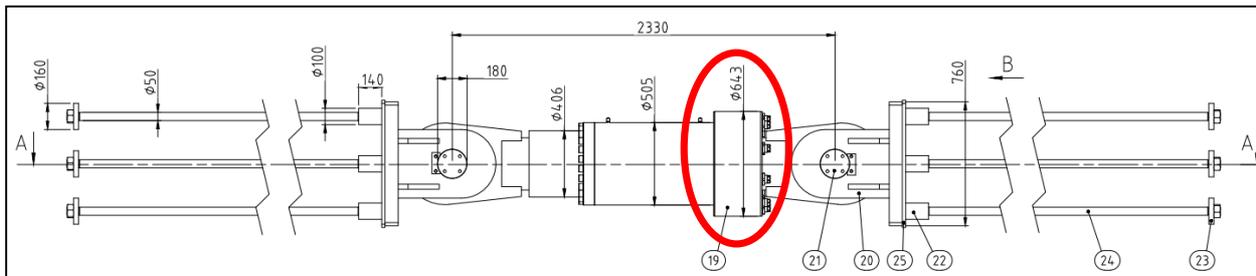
Elevation of the Reston-SA shock absorber with concrete anchors and fuse
